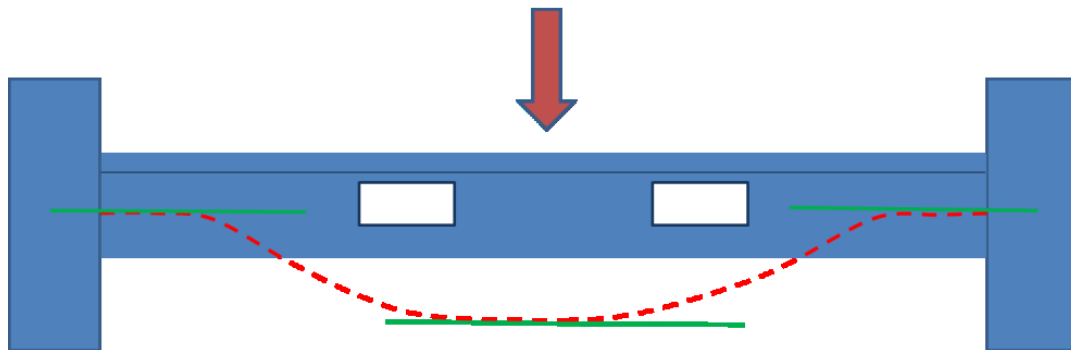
Typical SMF beam under vertical loading (Lemnitzer et al., 2013).
